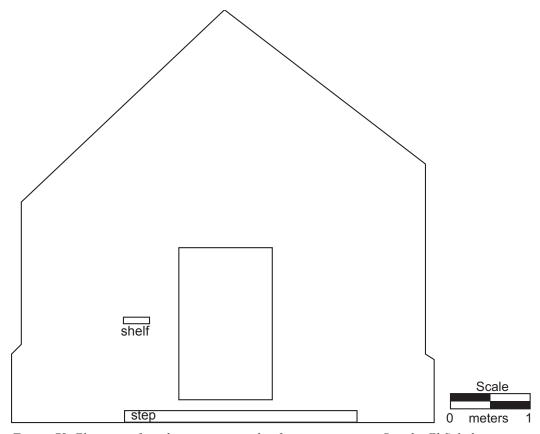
Elevation of southeast exterior side of stone structure at Rancho El Saladito.
